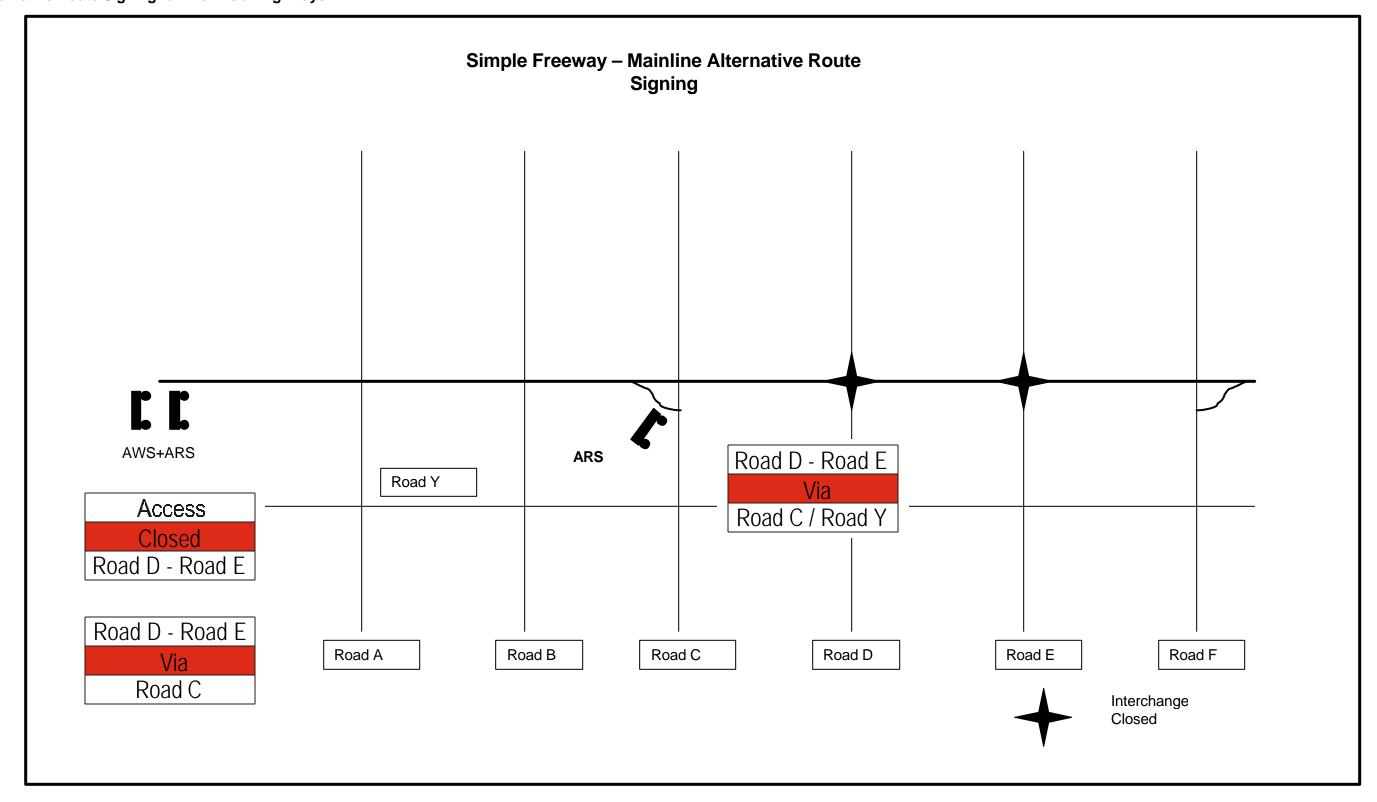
Simple Freeway – Mainline Alternative Route Signing
